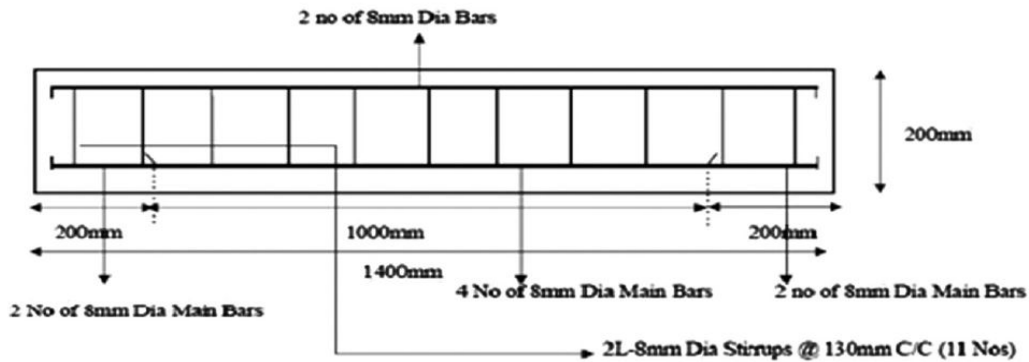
2: Reinforcement detailing of the beam (Sen, 2016)
